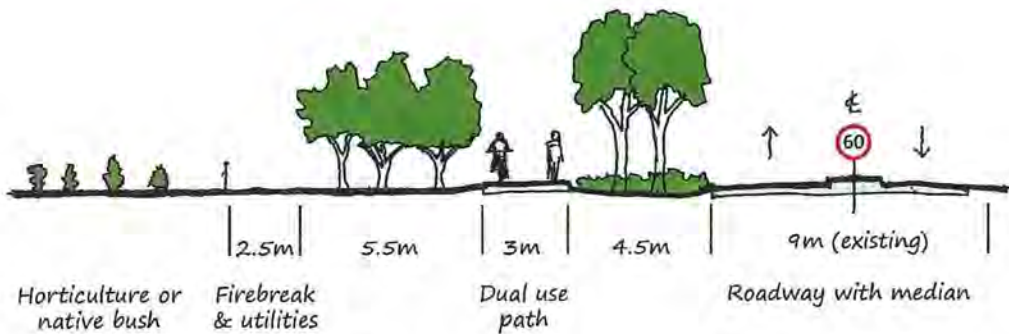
Possible Robinson Street Horticultural and Native Bush Sketch Strategy (showing half reserve).
